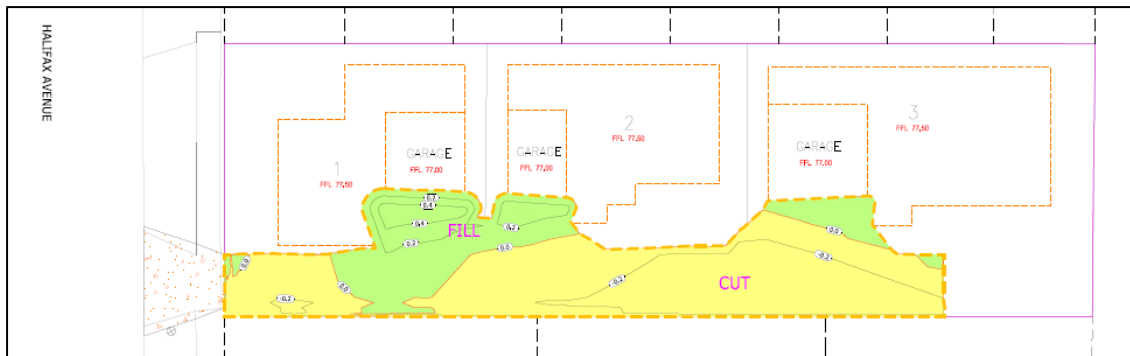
Cut and Fill Plan (Appendix A – Engineering Plans: FP328-21)
